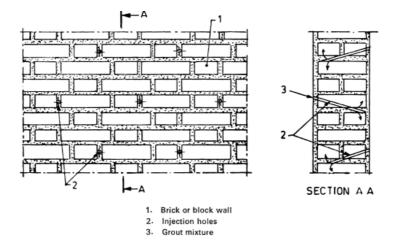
Grout or Epoxy Injection In Existing Weak Walls
